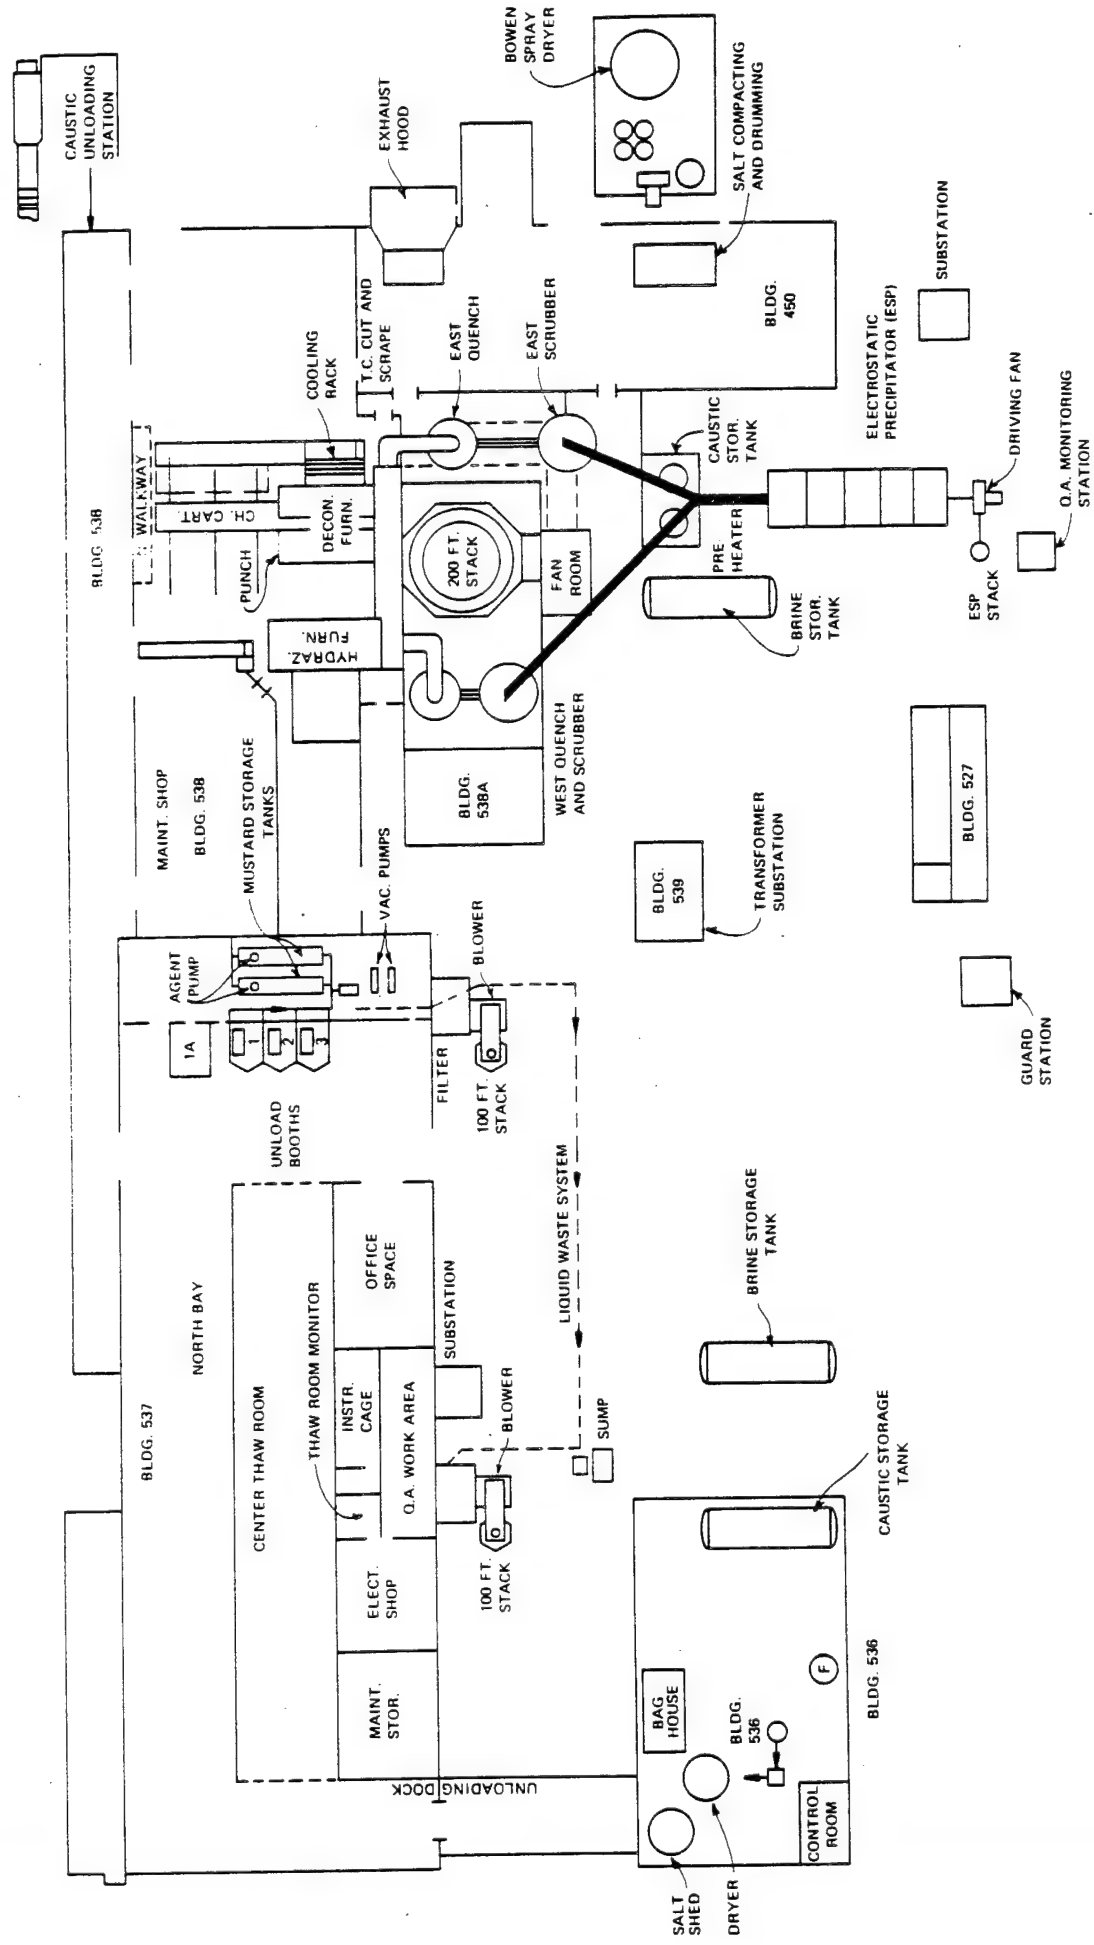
PLANT LAYOUT - MUSTARD DISPOSAL FACILITY, ROCKY MOUNTAIN ARSENAL - AS OF 1 NOV
